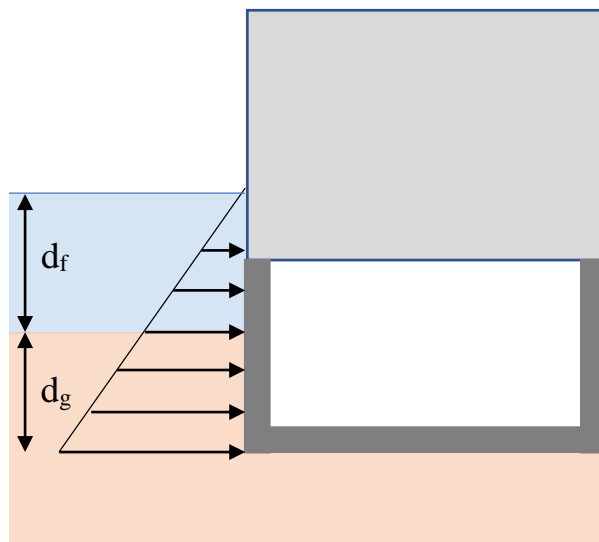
Hydrostatic loads on basement walls in submerged soil conditions
